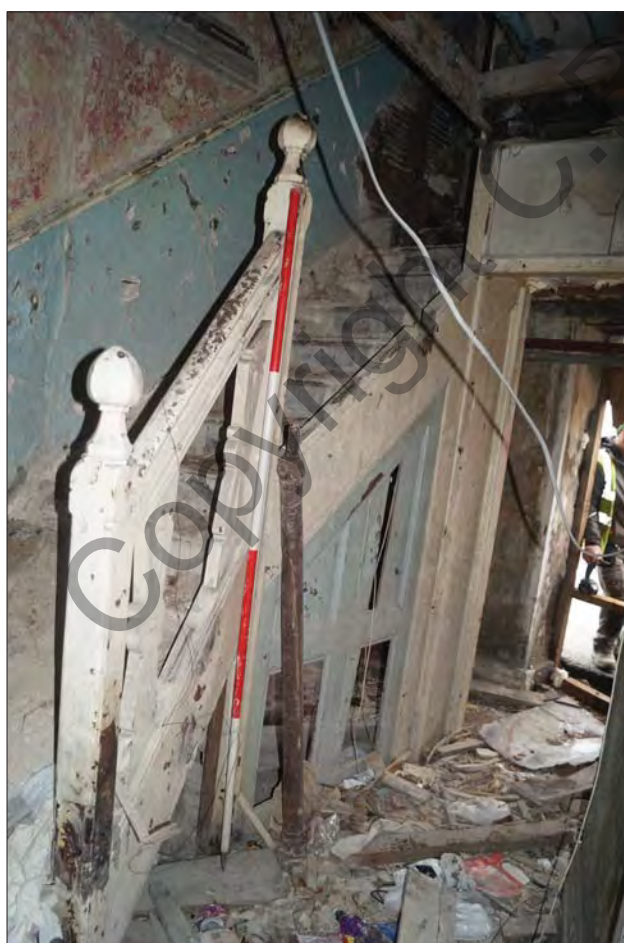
28. Plas Alltran Ground Floor Room G01
